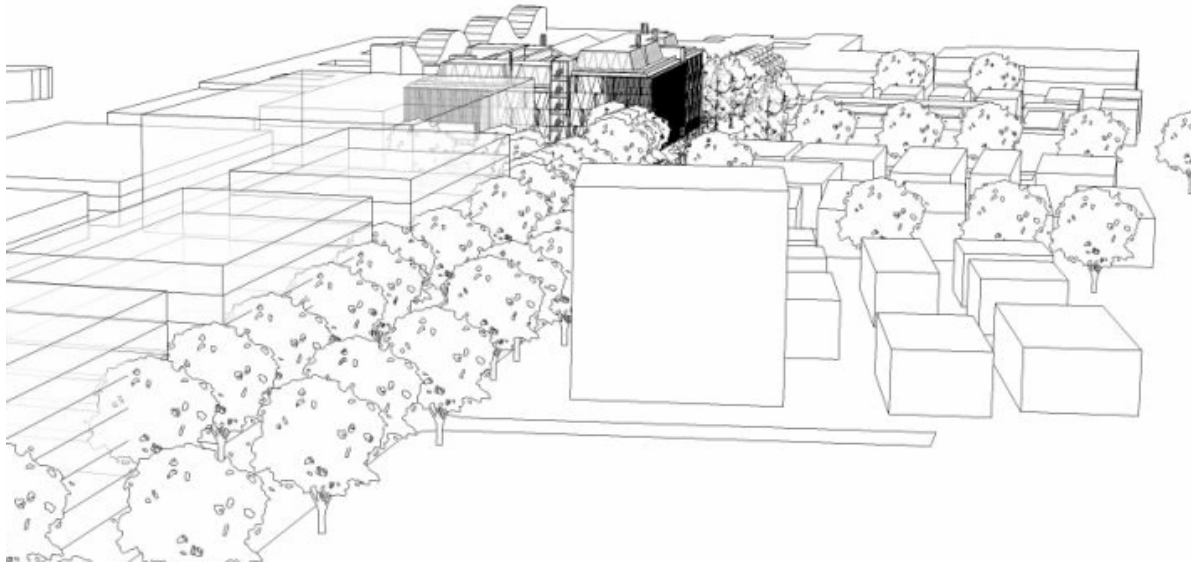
Potential streetscape along Hawkesbury Road showing existing 10 storey building in foreground.
